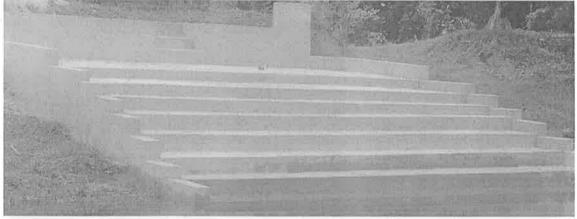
Construction of Bathing steps near the temple at village Adbhar.
